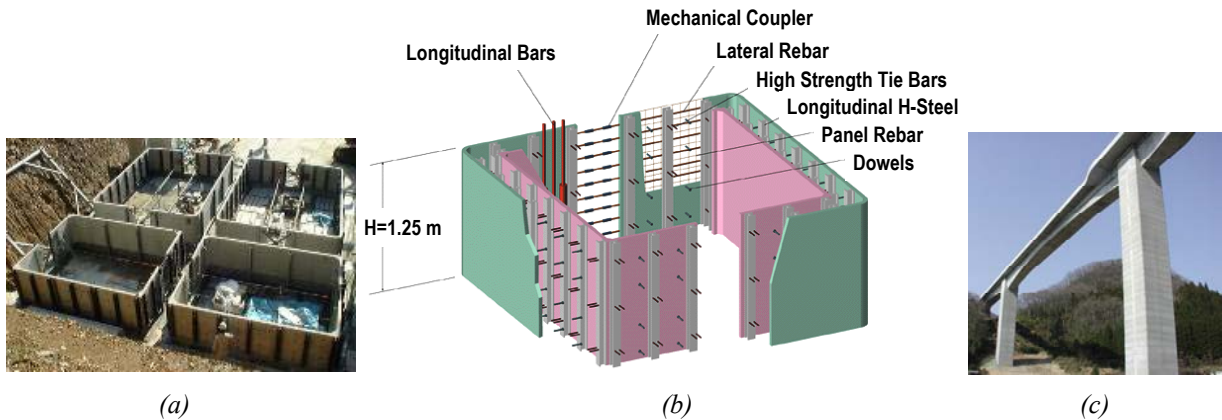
Partially-Precast Segmental Pier System for Hollow Columns: (a) Interior and Exterior Precast Panels; (b) Reinforcement Details; (c) Completed Piers. (Courtesy of Sumitomo Mitsui Construction Co.)
